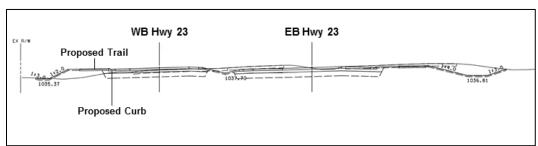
Proposed Hwy 23 Cross Section East of 14th Avenue SE
